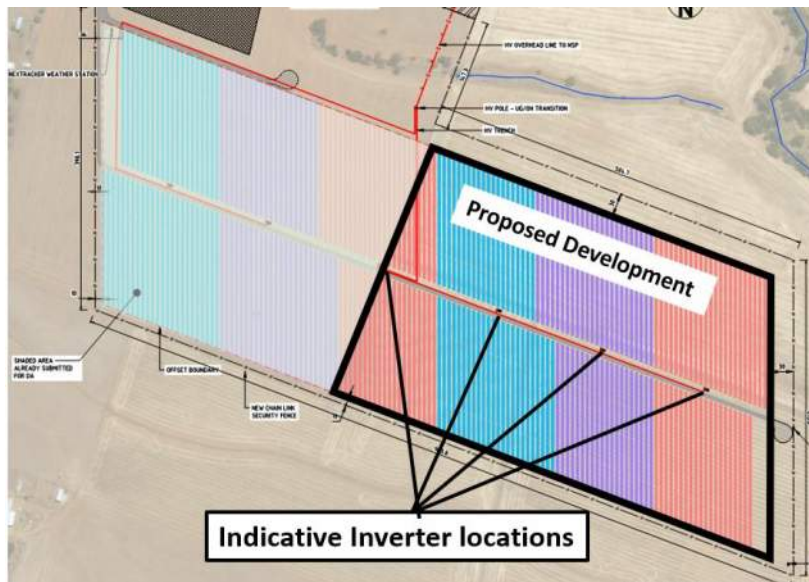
Typical Ground-mounted, Single Access Tracking Solar Panel Layout (see Appendix B- Design Drawings for greater detail)
